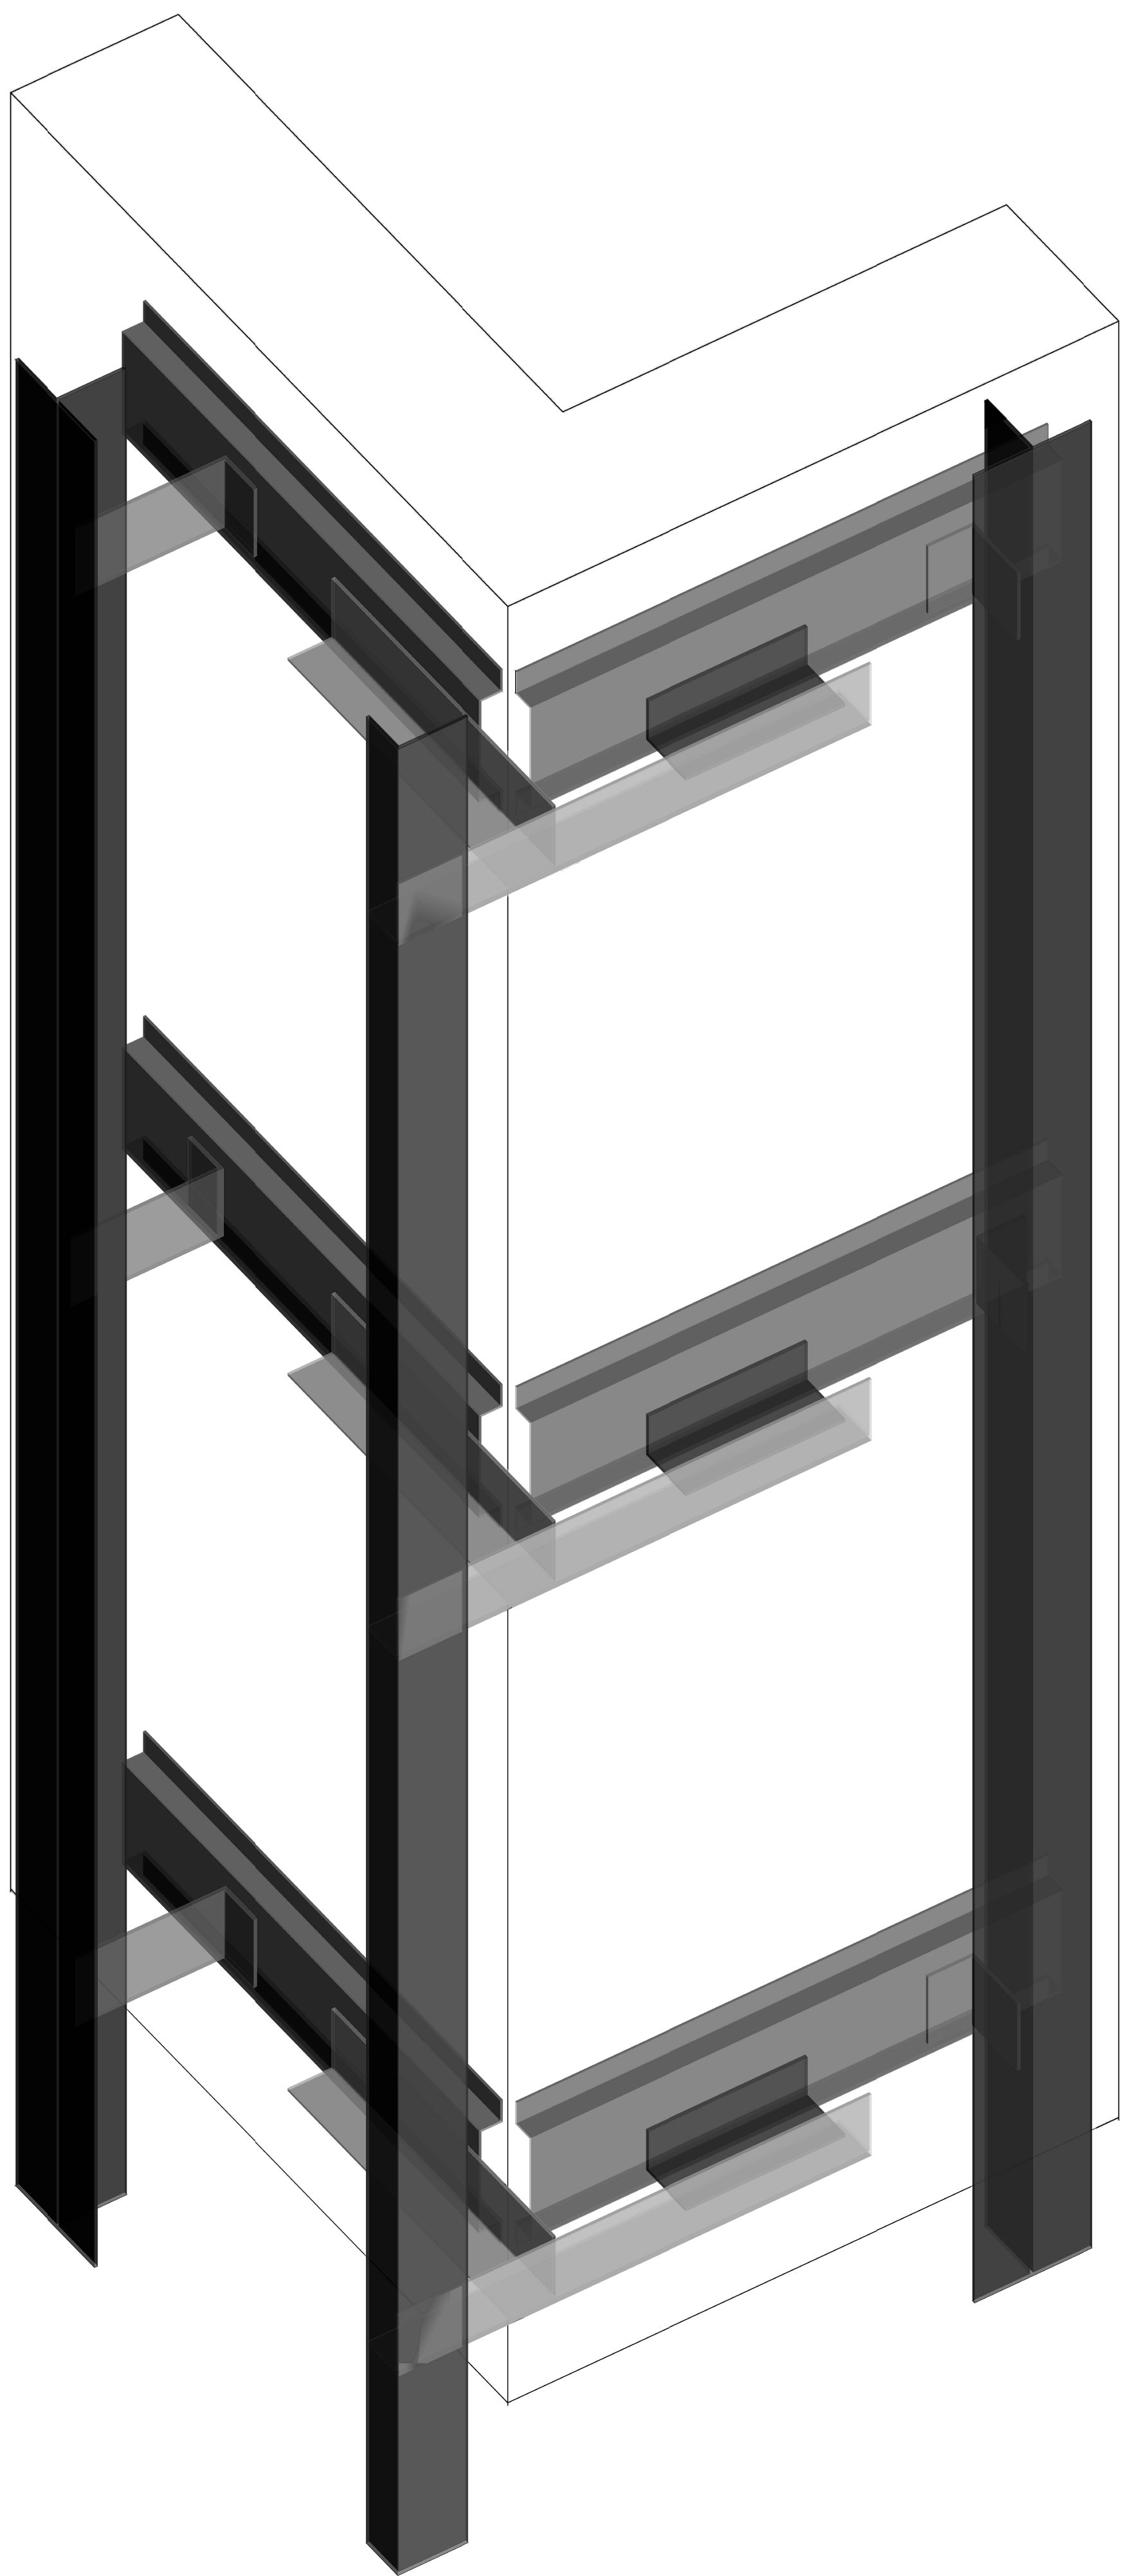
DETAIL B - TYP. WALL SECTION W/OUT DEFLECTION JOINT (CONTINUOUS SYSTEM)
